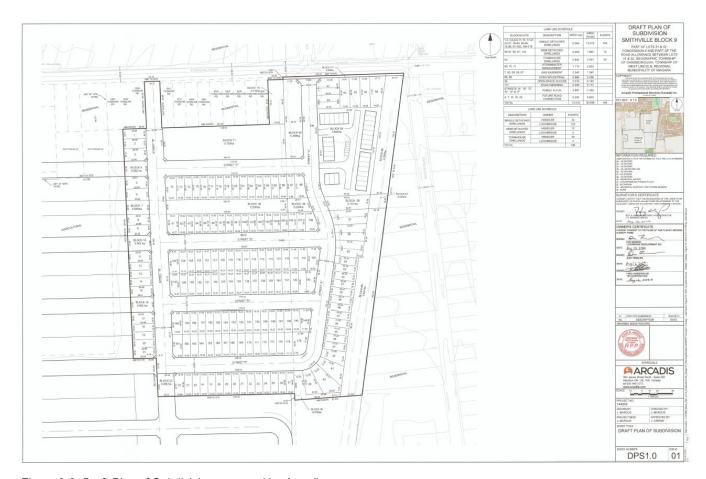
Draft Plan of Subdivision prepared by Arcadis
